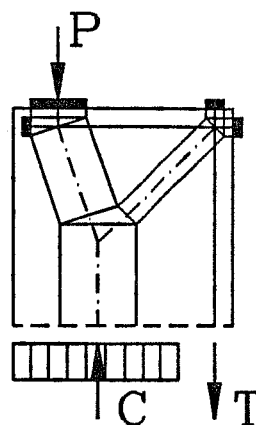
Strut-and-Tie Model for Eccentrically Loaded Anchorage Zone
